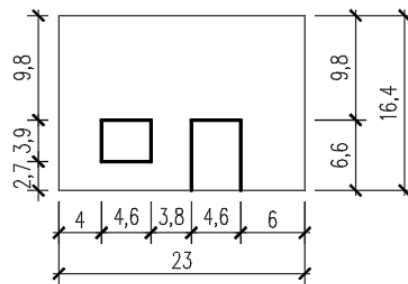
The front wall of the structure is subjected to blast waves (unit ft).
